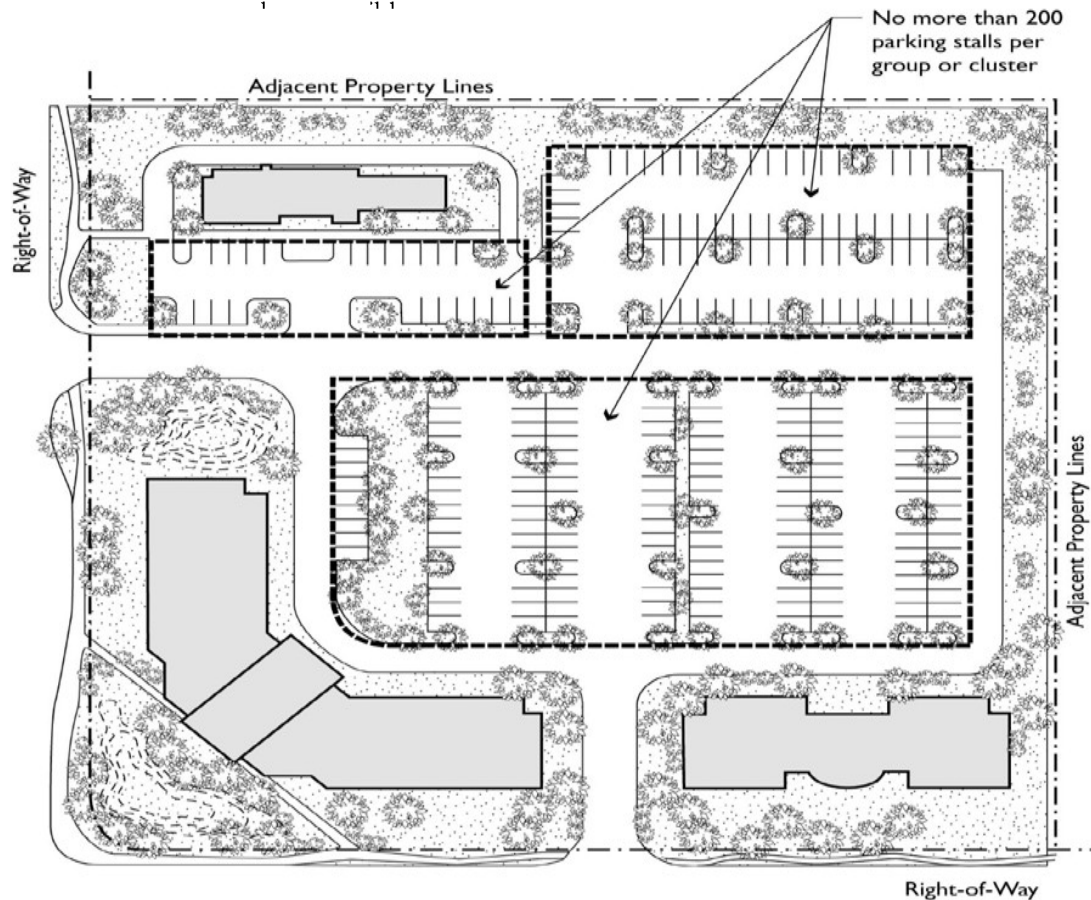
H.(2): PARKING LOT LAYOUT
